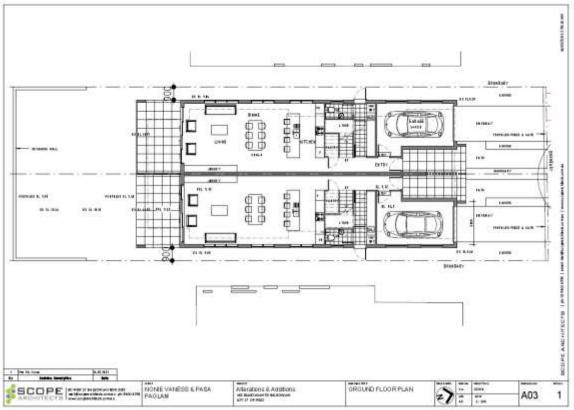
Above & previous page illustrates the as proposed Plans & Elevations.
